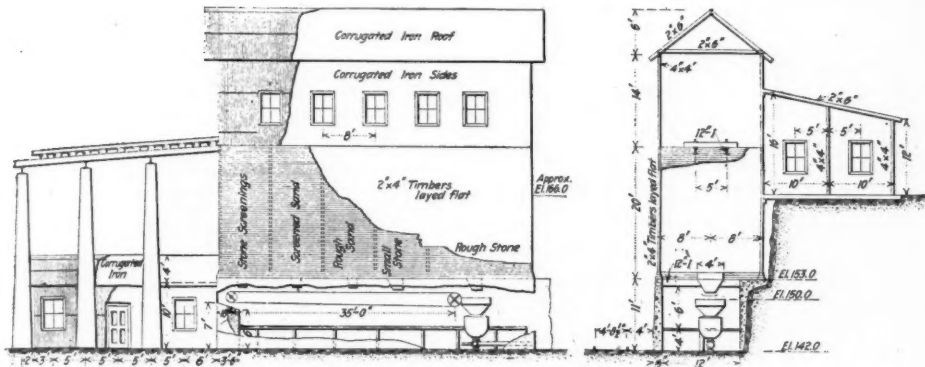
GENERAL LAYOUT OF MIXING AND CONVEYING PLANT.
